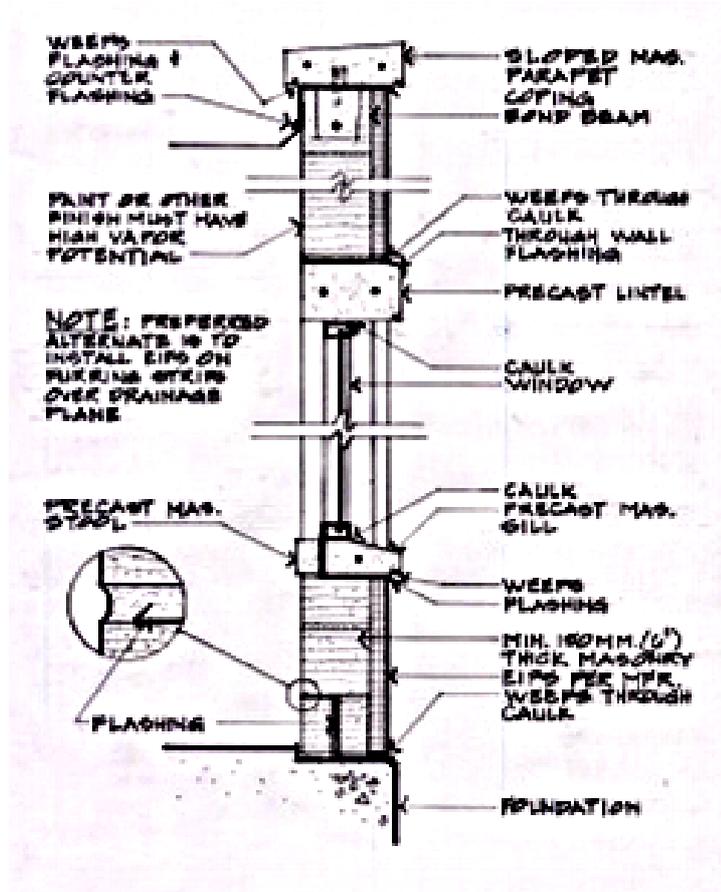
Wall Section Showing EIFS Cladding on a Masonry Substrate
